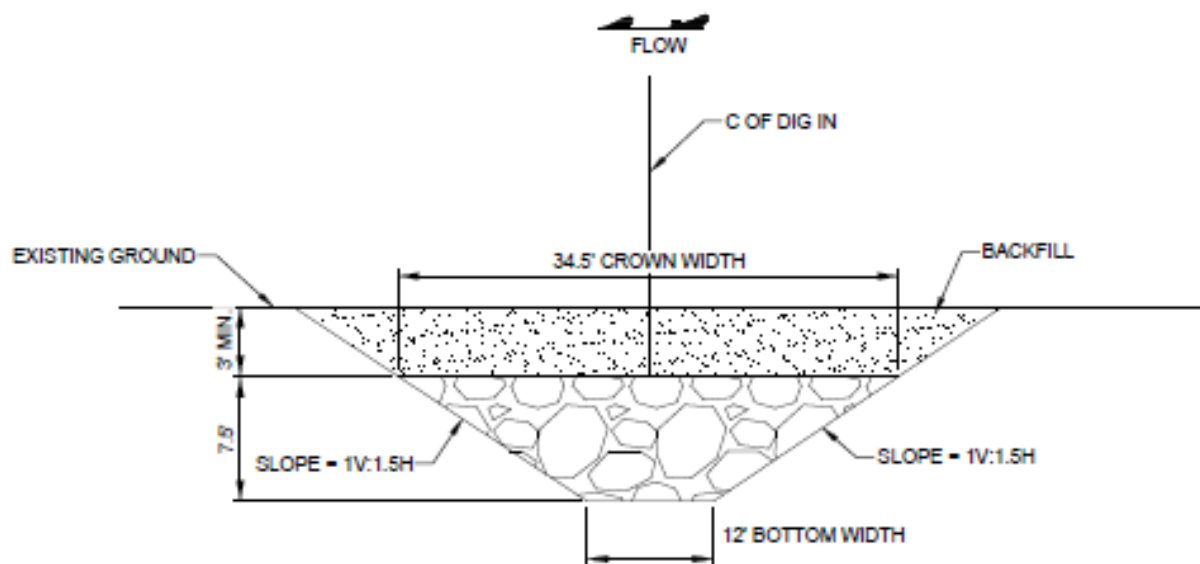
Typical Section for 34.5-FT Crown Width Dig-In (A7)
